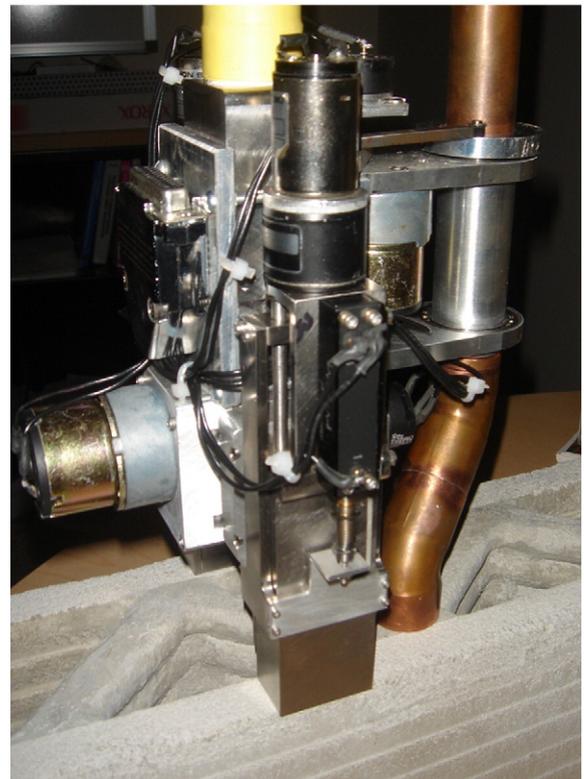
Contour Crafting nozzle constructing a hollow wall.
